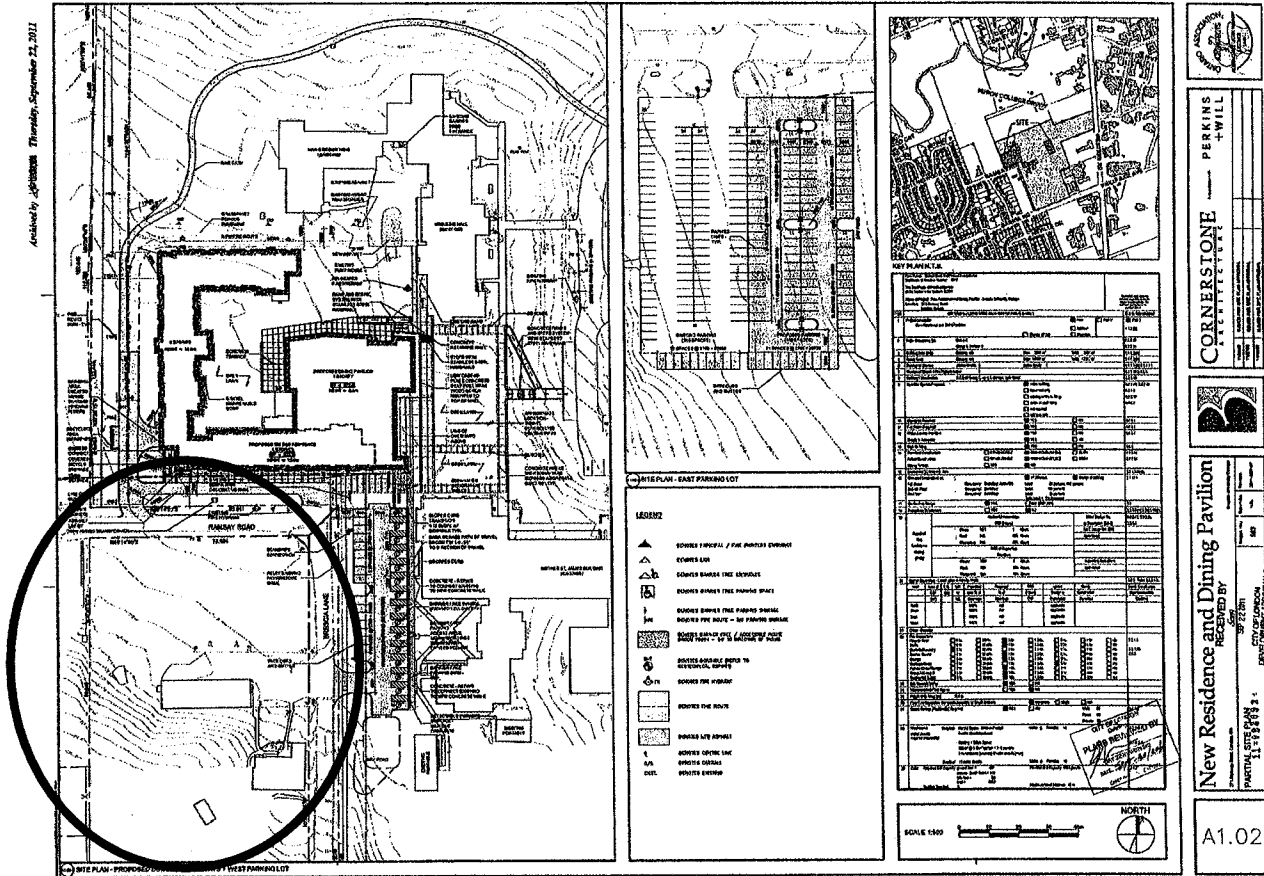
Site Plan Application depicting the development of a Student Residence and Dining Pavilion with the subject lands encircled
